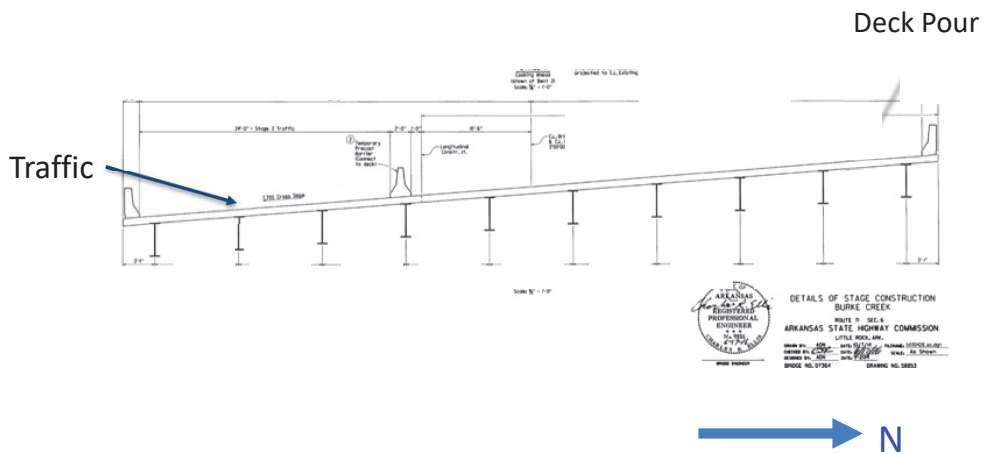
Burke Creek Bridge Cross Section (Burke Creek & Coss tot Relief Streams, Bridge Cross-Section, Arkansas Department of Transportation, 2016)
